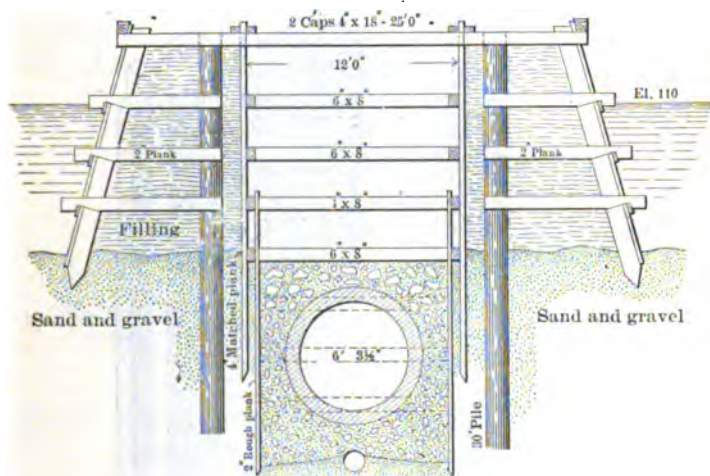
SEWER COFFER-DAM. BOSTON SEWERAGE SYSTEM.
